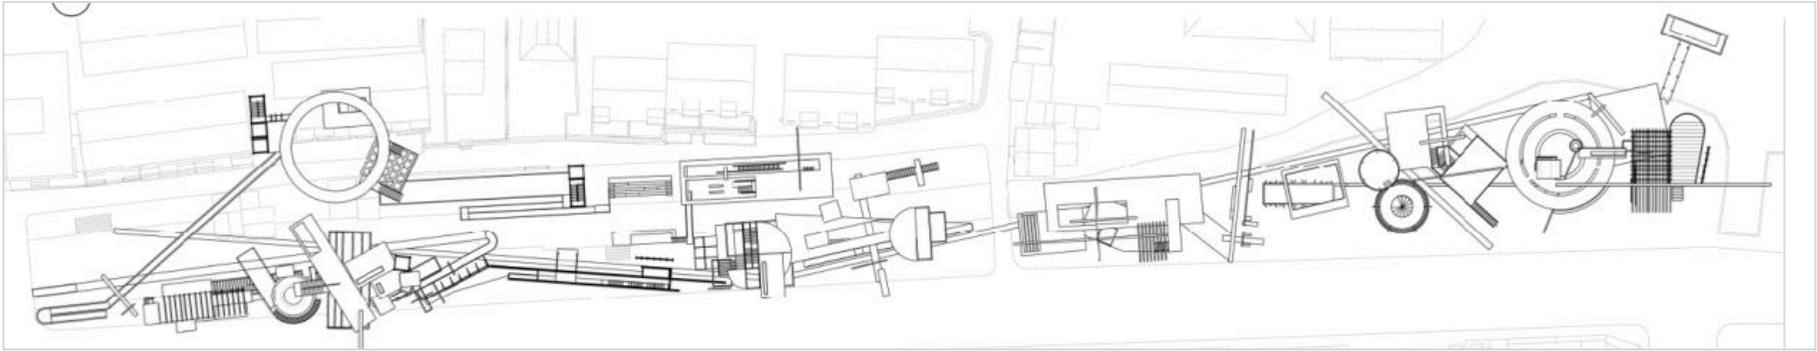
Final Site Plan, drawings by Ruoxi Li.
